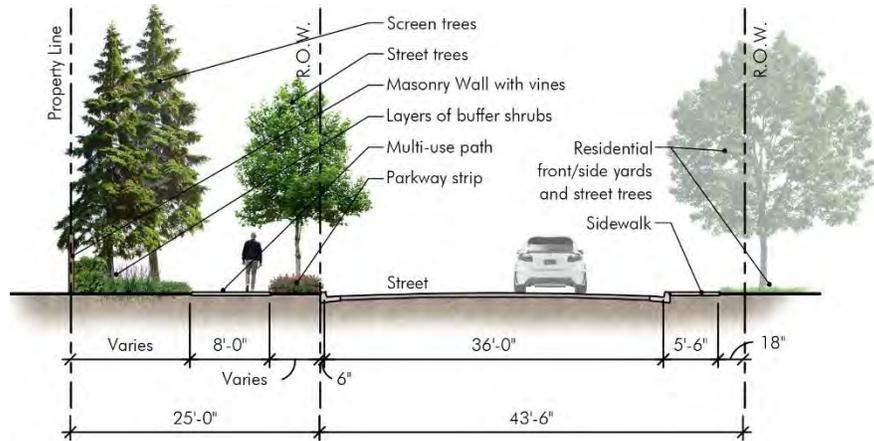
Local Street Parallel to Railroad north of Park (looking north)
